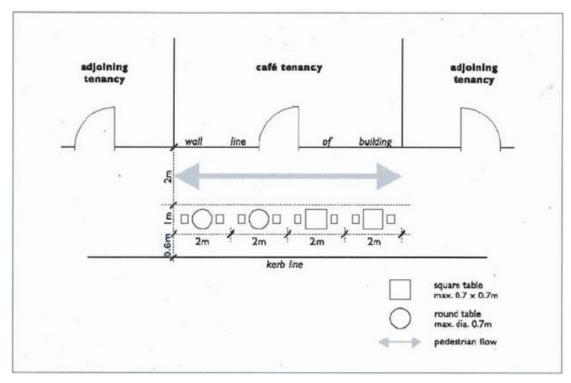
Example of a seating layout for a standard footpath. Chairs are sited so as not to intrude on the 2m wide pedestrian corridor.
